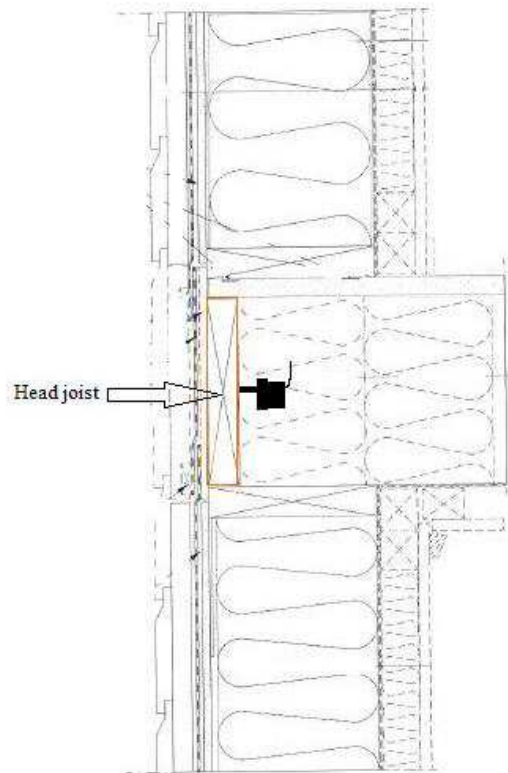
Cross section of the element detail of the wall elements of the first and second floor, and the floor element between these. The positioning of the head joist is marked
